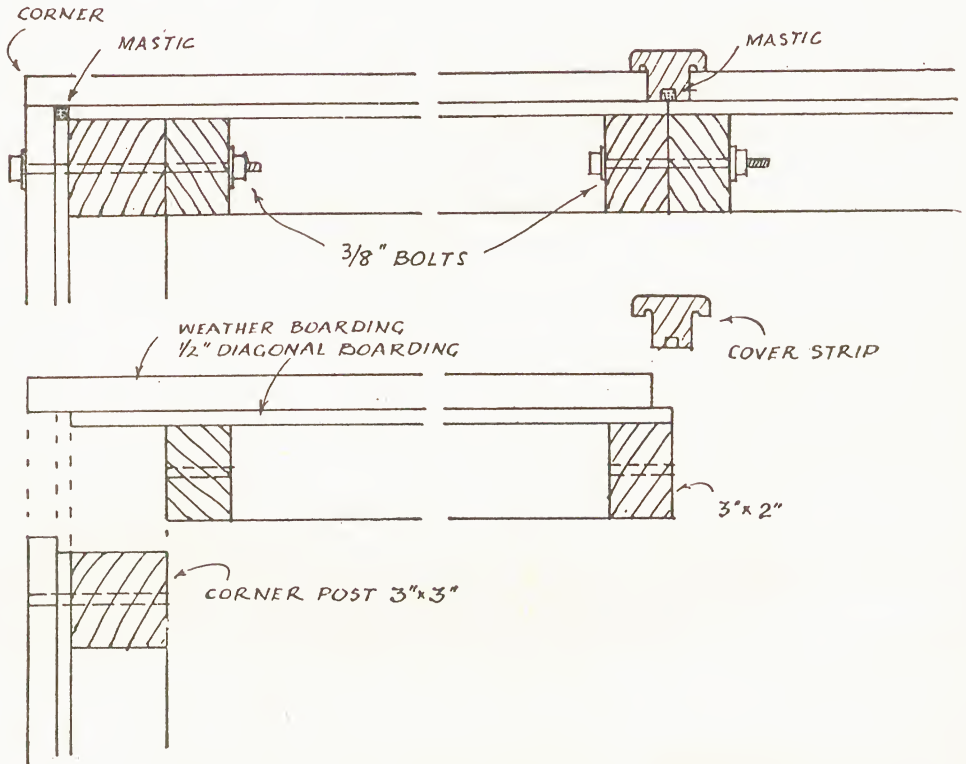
Sectional construction for small timber buildings. Sections are bolted together.
